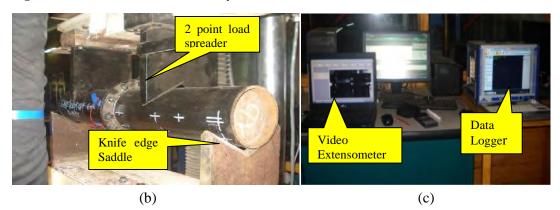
(b) Side view of a simply supported specimen with two points loading system, (c) Data acquisition by UTM machine, video extensometer and data logger.
